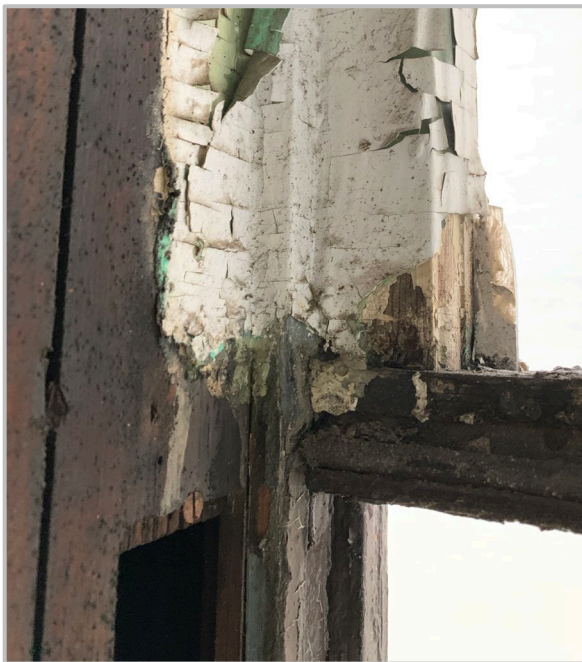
Interior view of the Top Rail, Side Rail and Interior Casing
